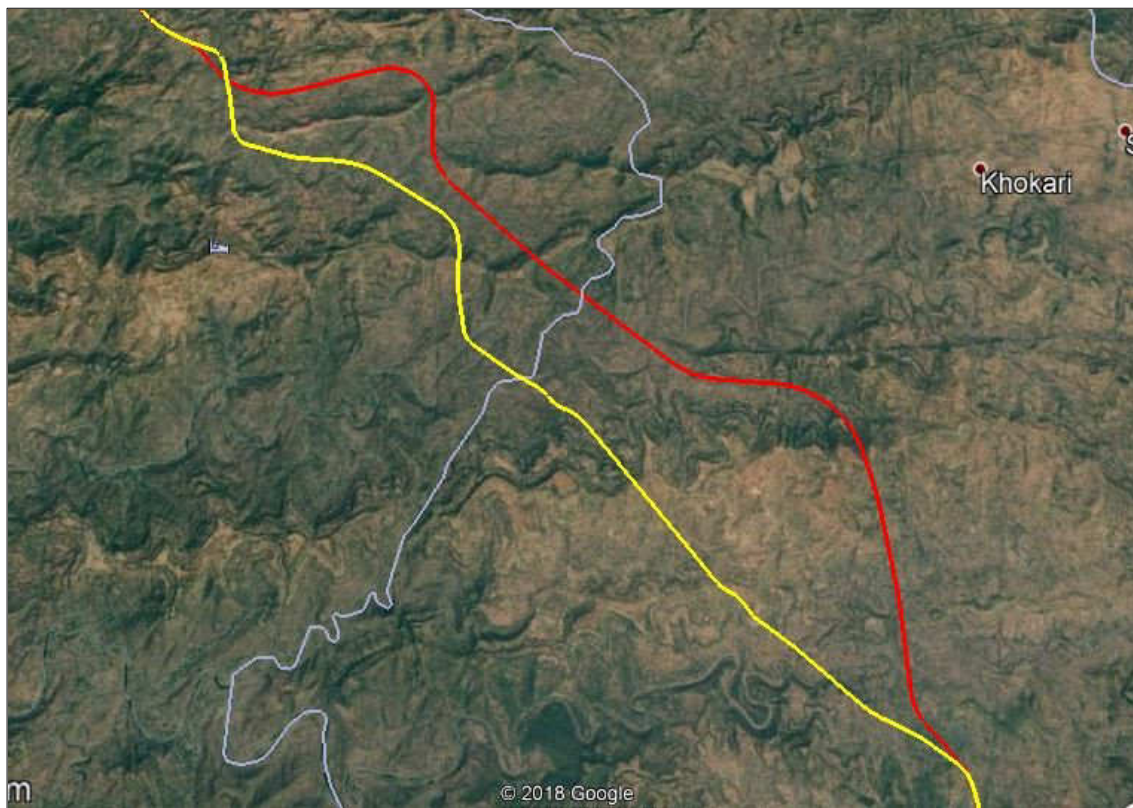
S-A Alignment Alternative proposal at Tunnel Locations
